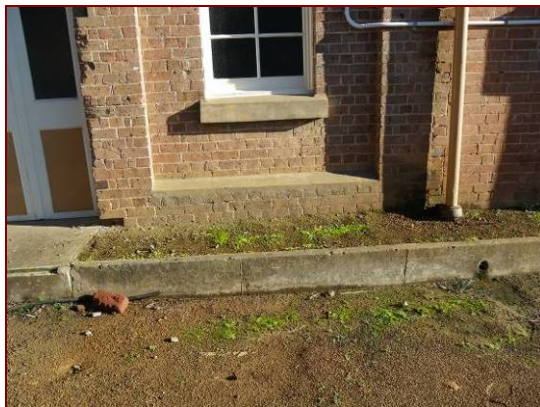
Garden beds built against the external walls, build up of algae on the ground and damp issues behind the downpipe.
